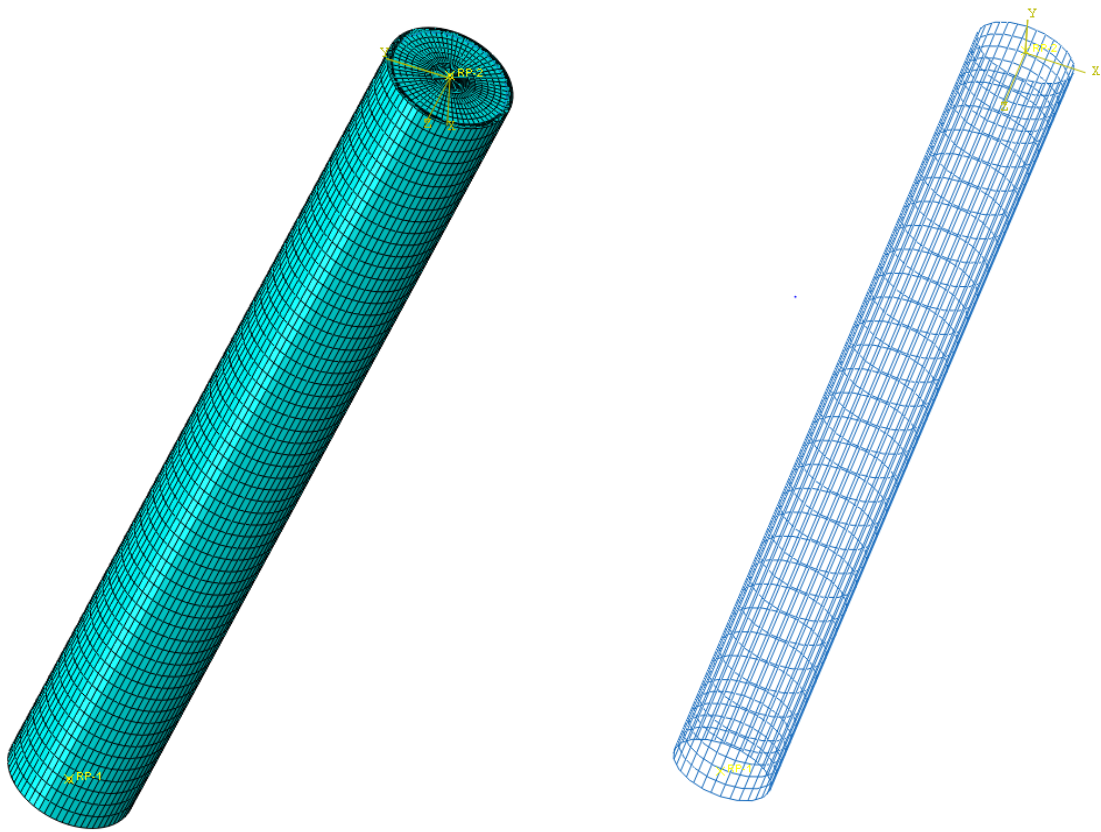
Mesh Configuration of Concrete and Configuration of rebar of the Example Column
